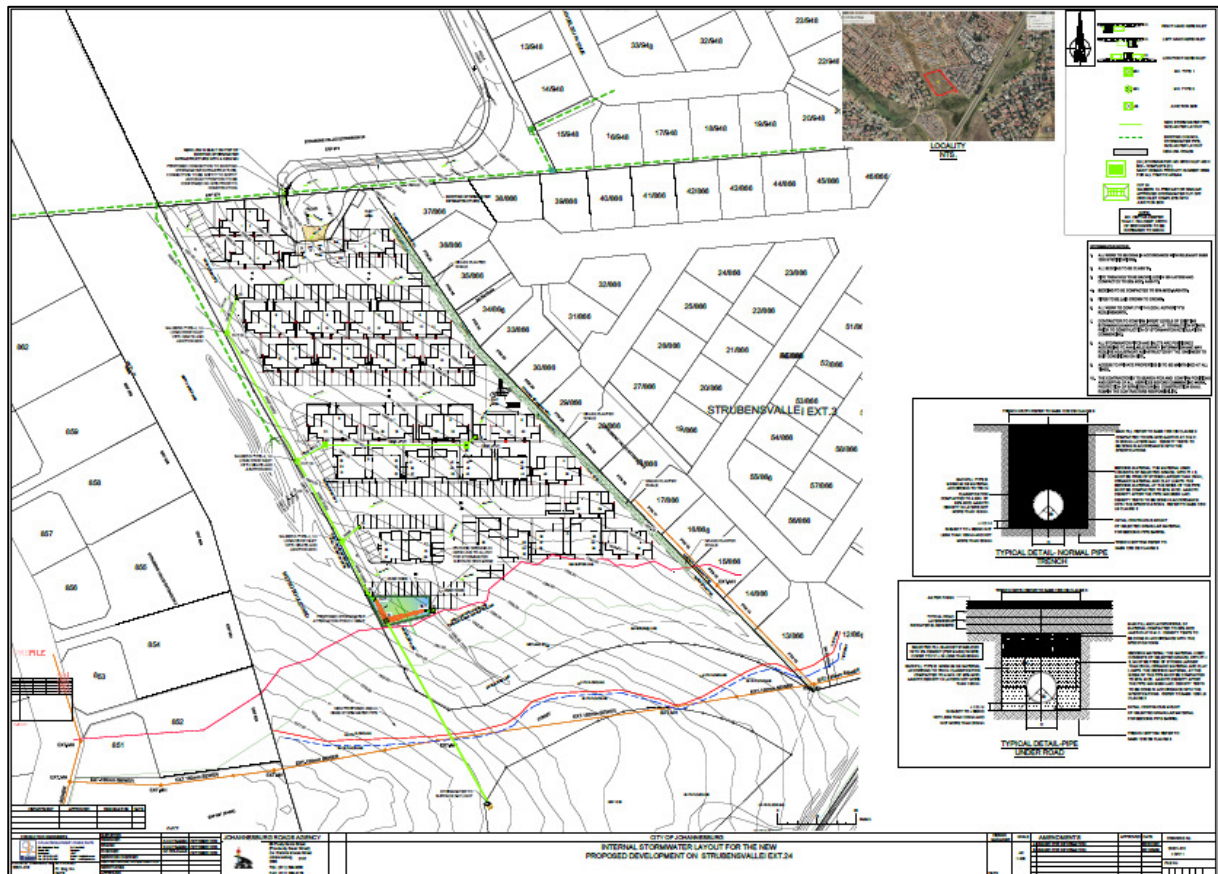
Internal Stormwater and Stormwater Attenuation
